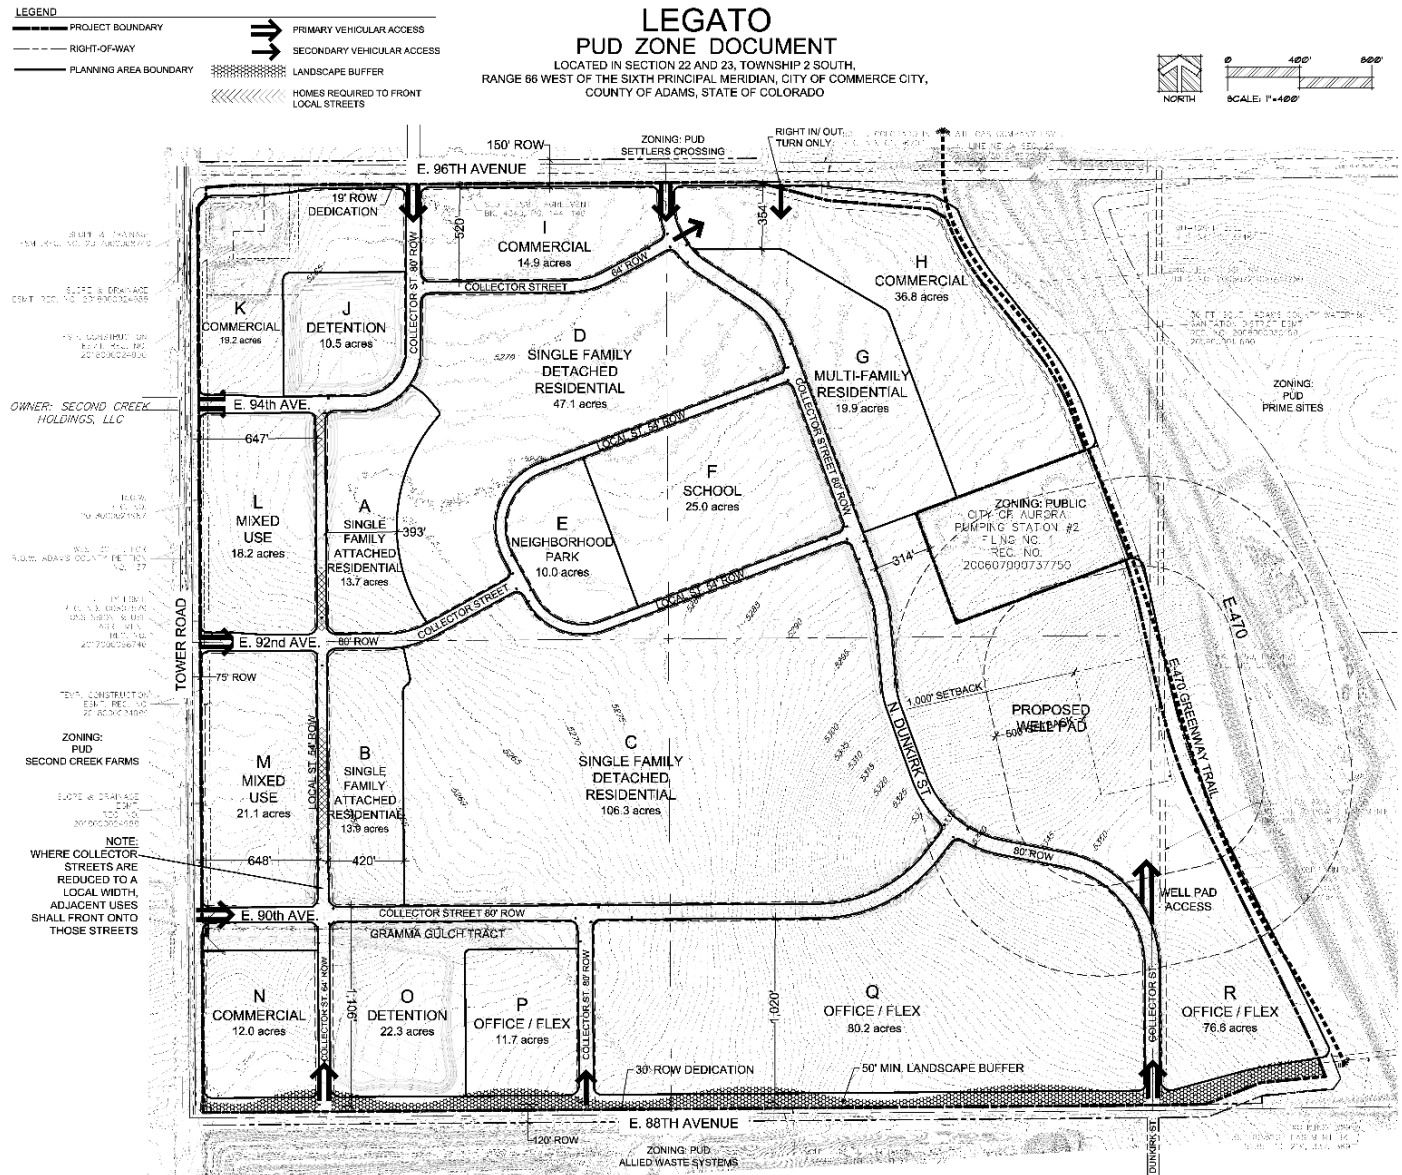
Community Design Elements depicting how proposed development is organized around the central park/school site and connected by a network of trails.
